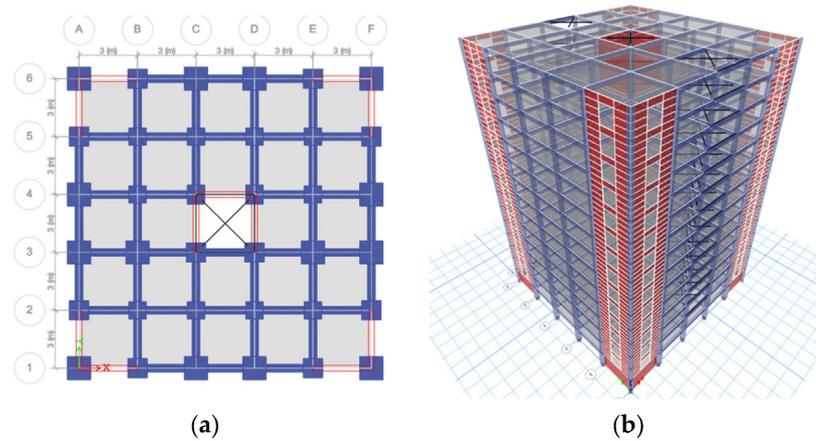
(a) G + 50 Framed Structure without shear wall Floor Plan; (b) G + 15 Framed Structure with shear wall Opening 3D Mode.
